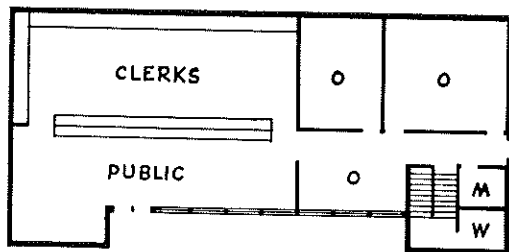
Floor plan of a small office building. 40'-0" \times 84'-0".
